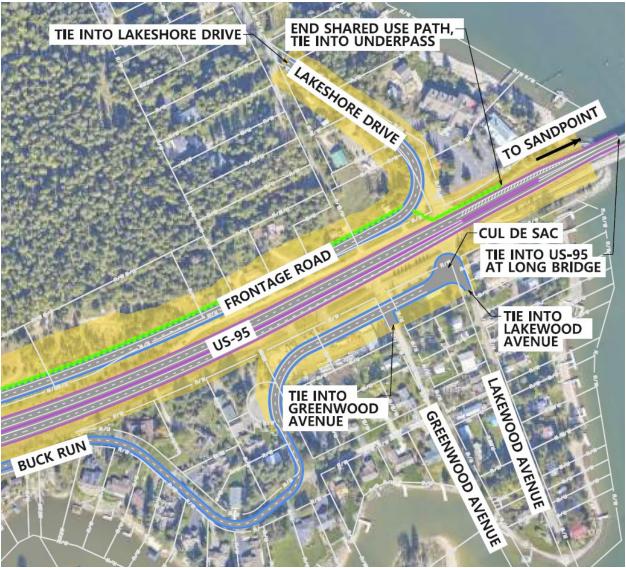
US-95 Proposed Action - Access Controlled Highway and Frontage Roads
